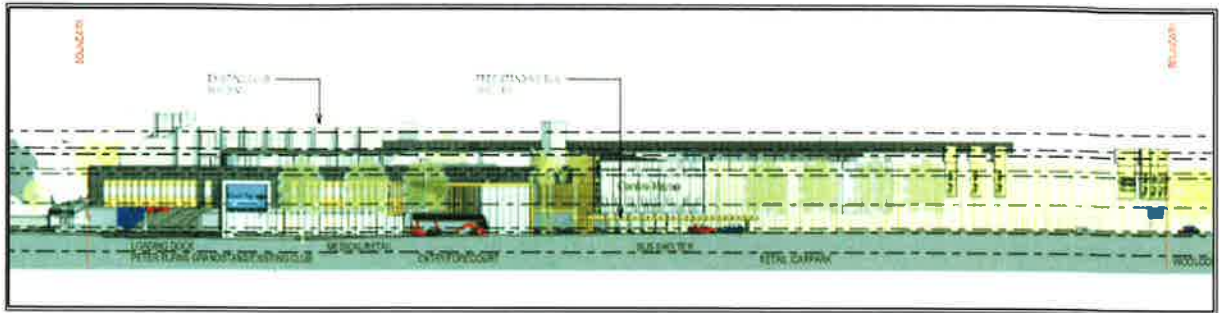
Southern Elevation - Captain Cook Drive (Approved) (Source: Approved Plans, 2013).
